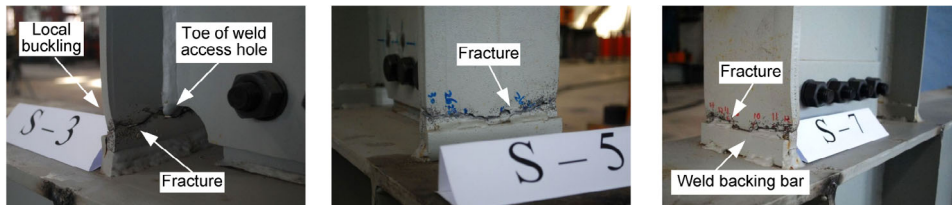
Typical failure modes of the test specimens (S-3, S-5, and S-7)
